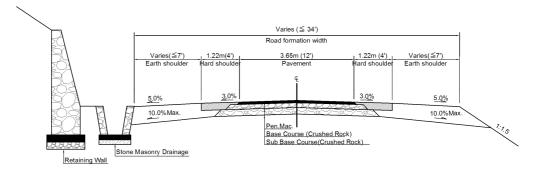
Typical Cross Section with Stone Masonry Retaining Wall and Drainage
